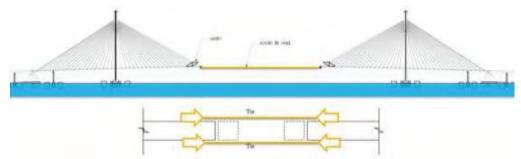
Tie-cable method for construction of partially earth anchored cable stayed bridge
